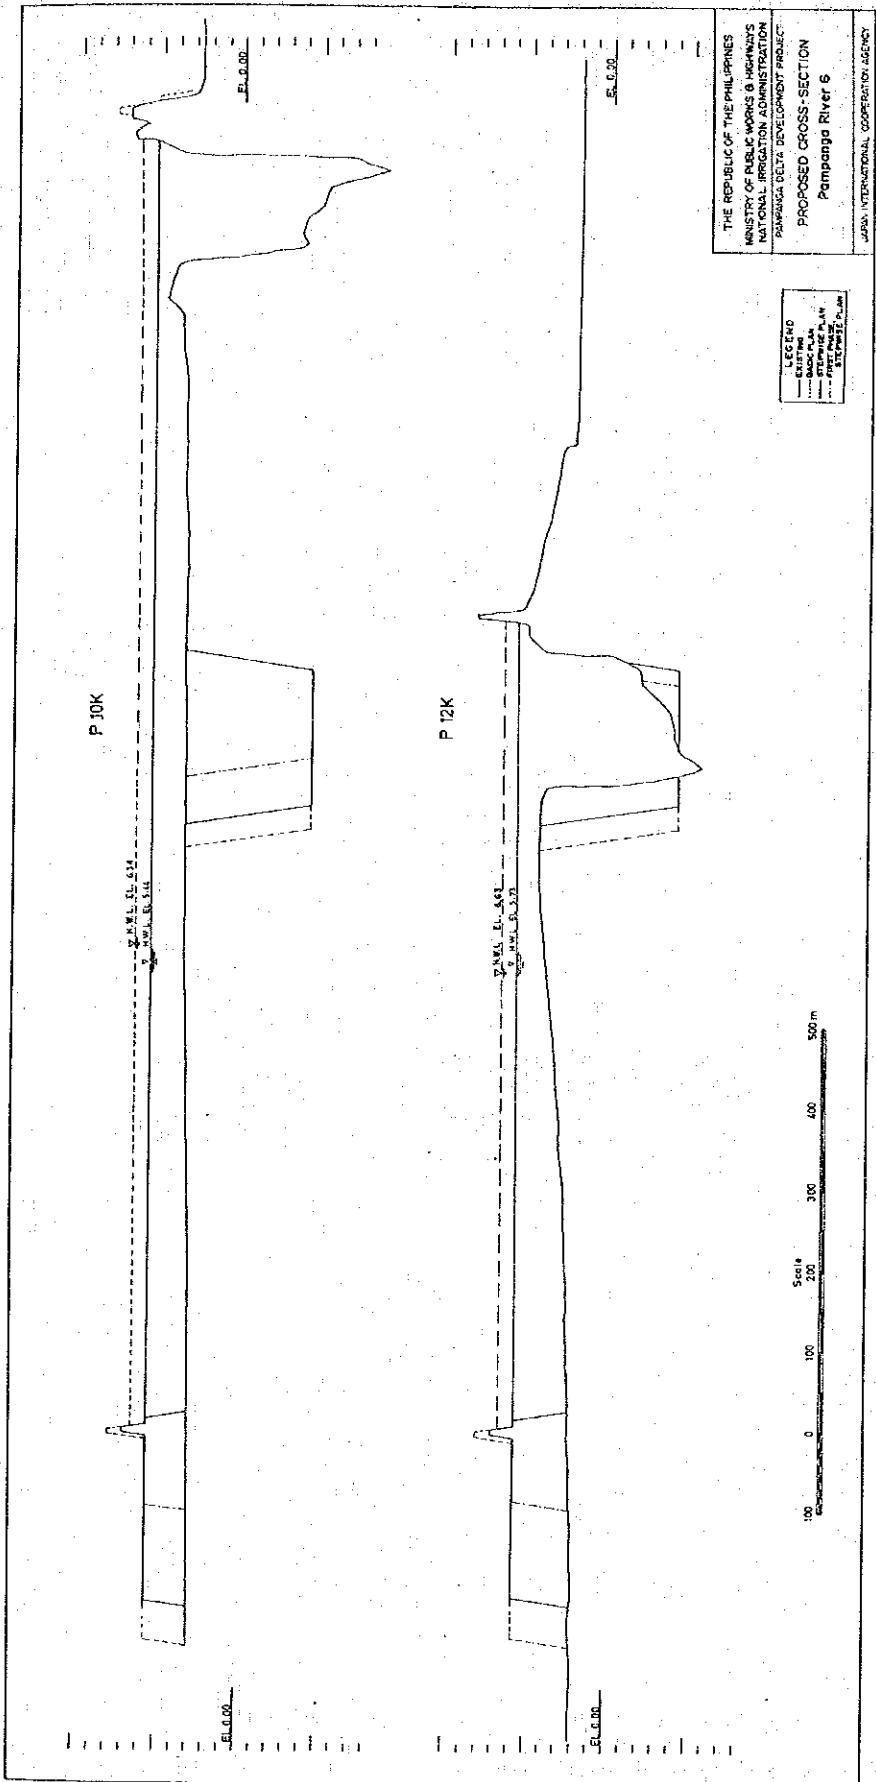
(7) PROPOSED CHANNEL CROSS-SECTION
